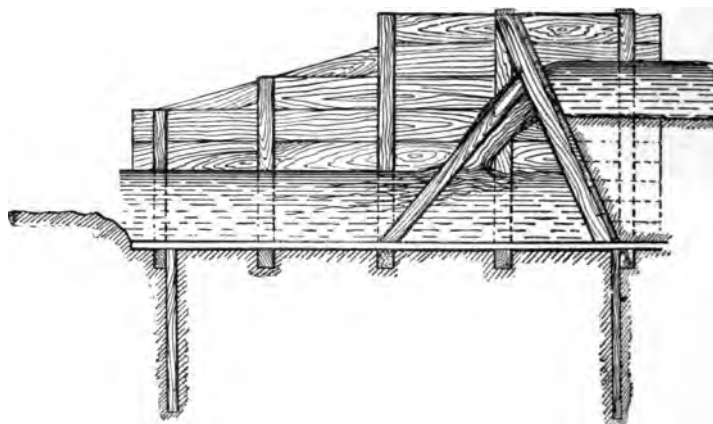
Timber Fall with Plank Panels or Flash Boards.
